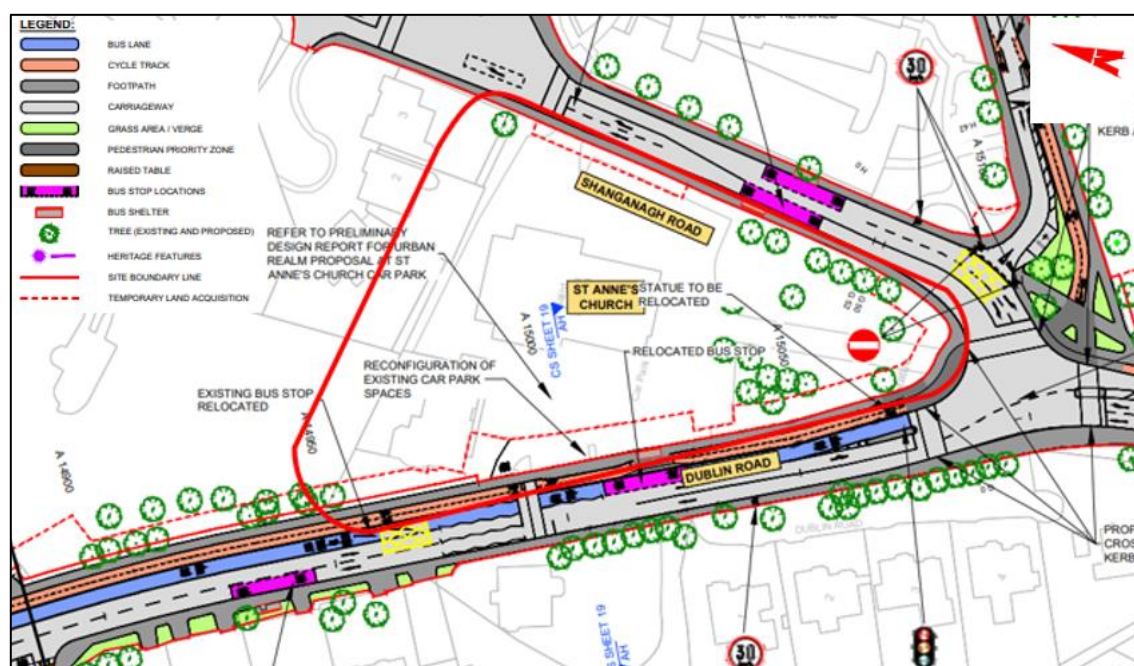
Extract from General Arrangement Drawing at St Anne's Church on Dublin Road (Sheet 43)
